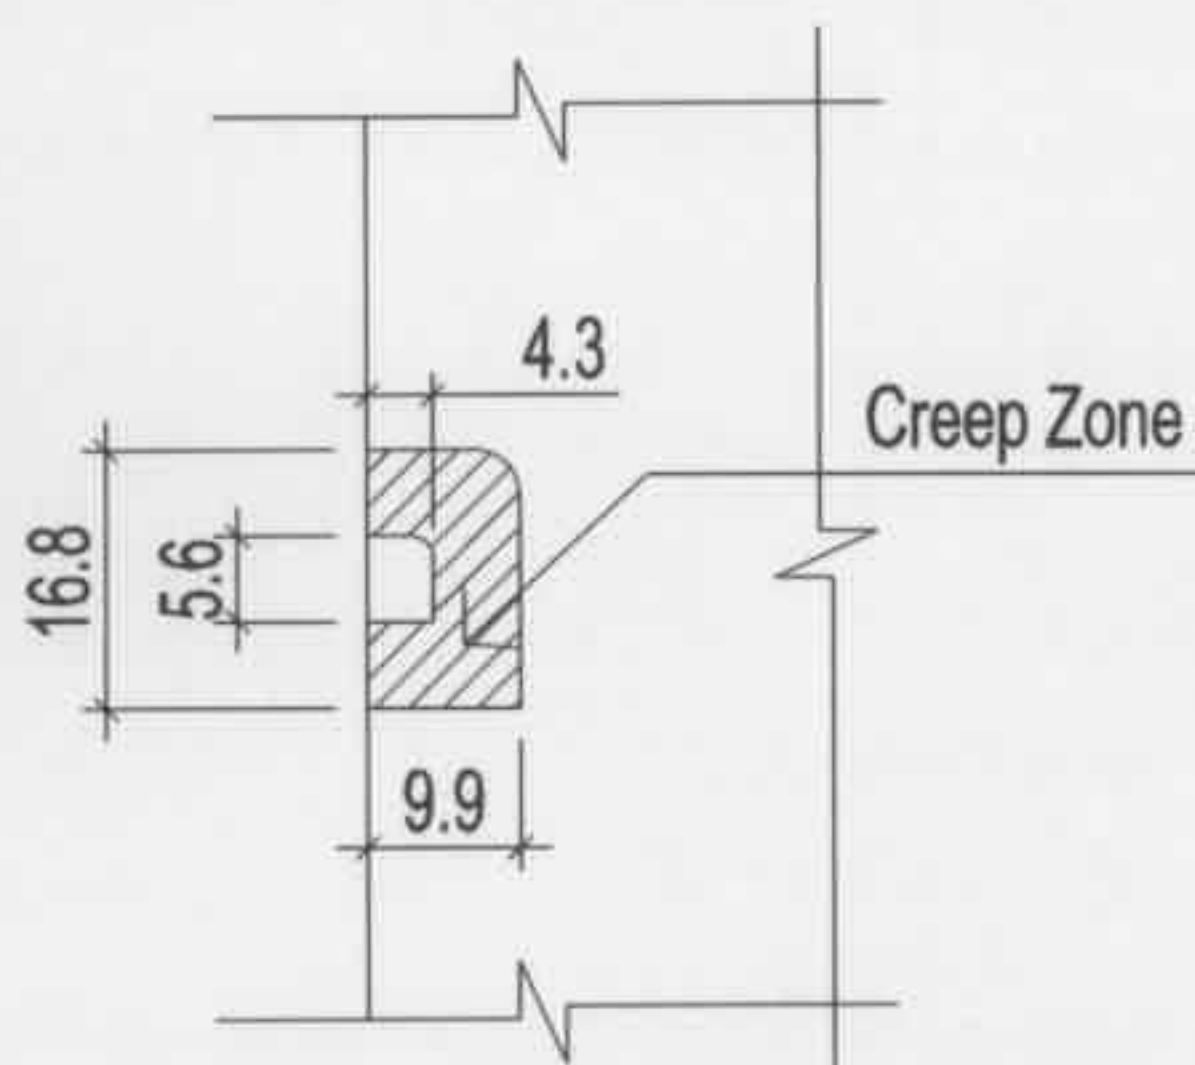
Creep Zone of flat roof tunnel (unit: m).
